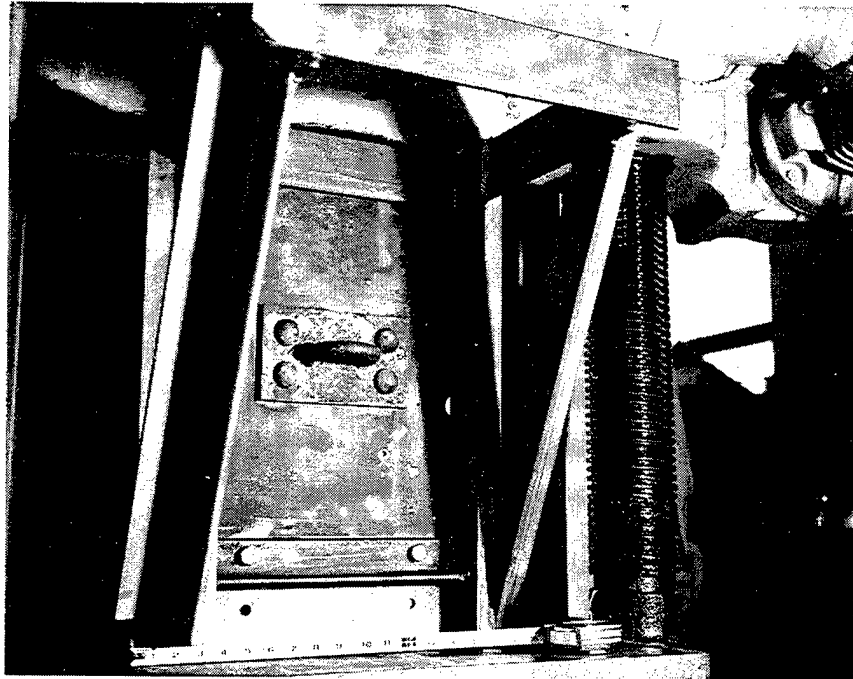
A view of the girder test plate bolted to the test jig with the tie-down U-shaped steel bar in the horizontal orientation (perpendicular to the tension load) for the pull test.
